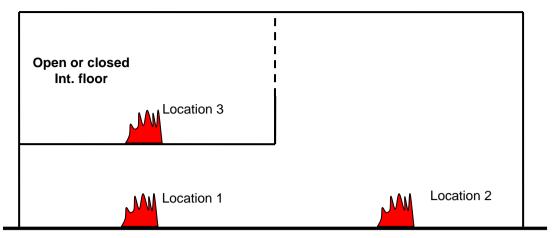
Schematic diagrams of a firecell containing open or closed intermediate floor and three possible fire locations (section view).
